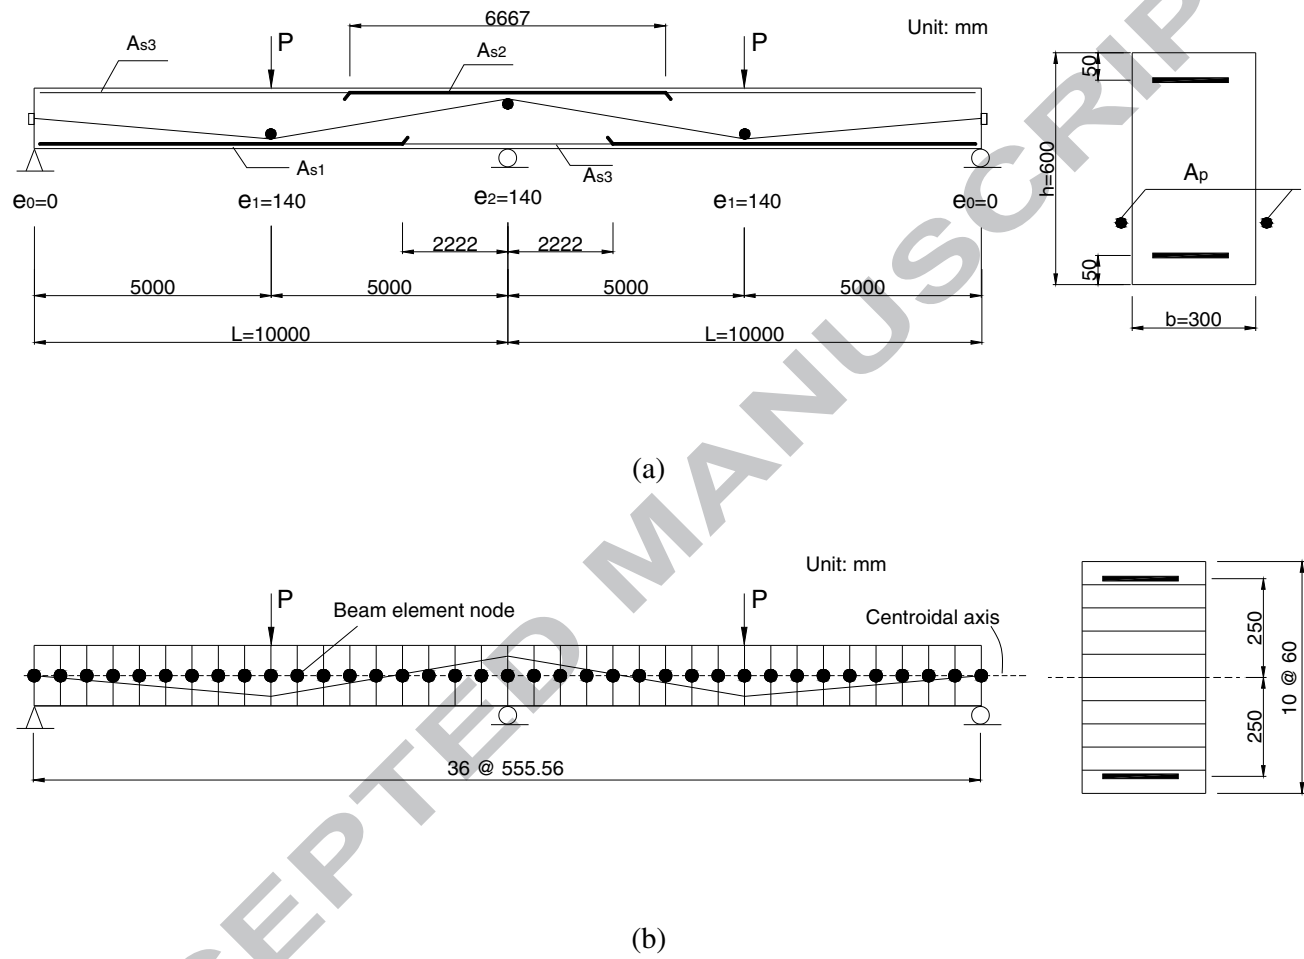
Control beam for numerical study and its finite element model. (a) beam details;
